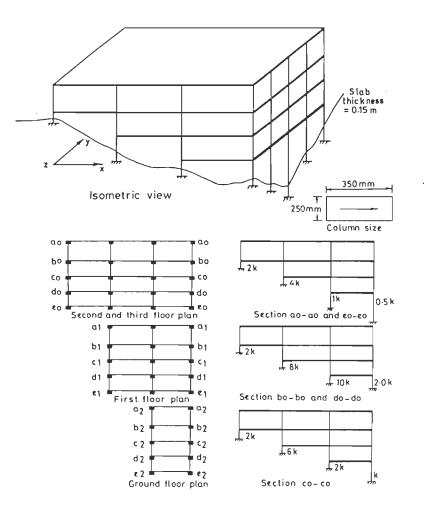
Multistorey R.C. Building on Hill Slope
